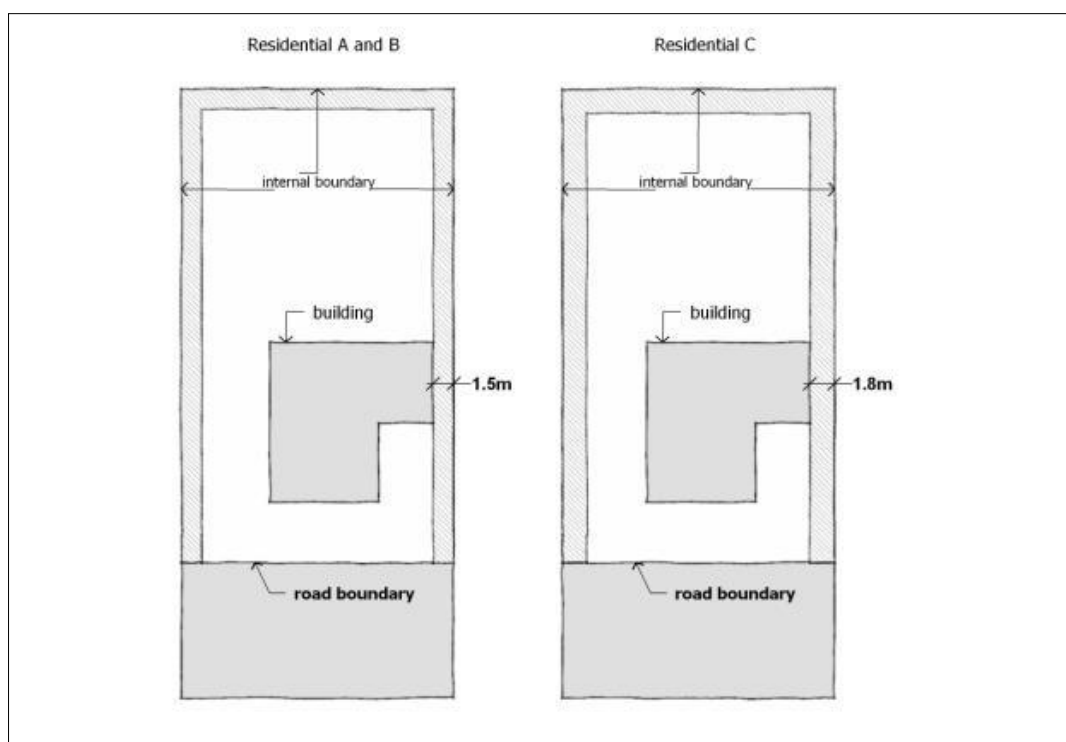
Boundary Setbacks - Stair, Landing and Balcony Exception
